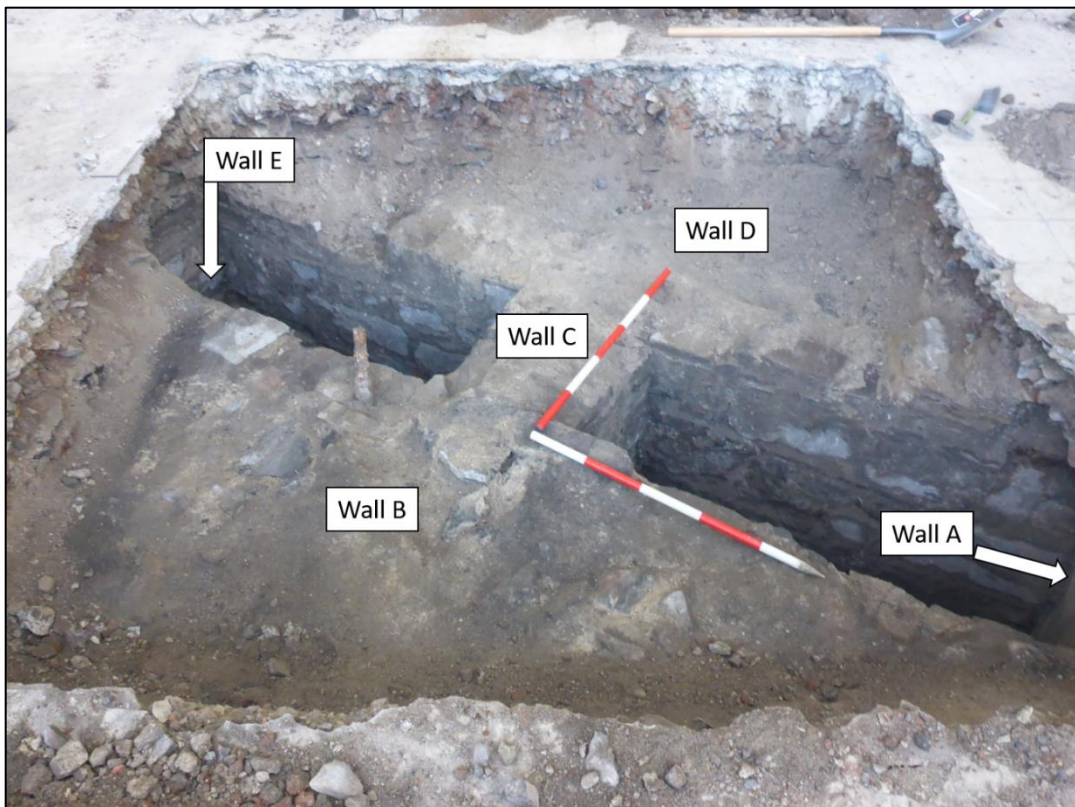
Test Pit 8 showing walls (A-E) and voids, view to south-southeast
